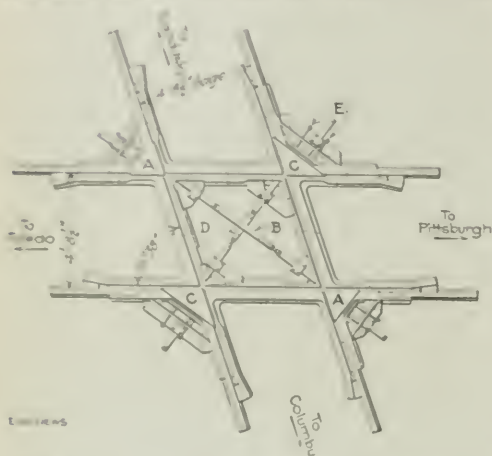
PLAN OF CONTINUOUS-RAIL CROSSING
